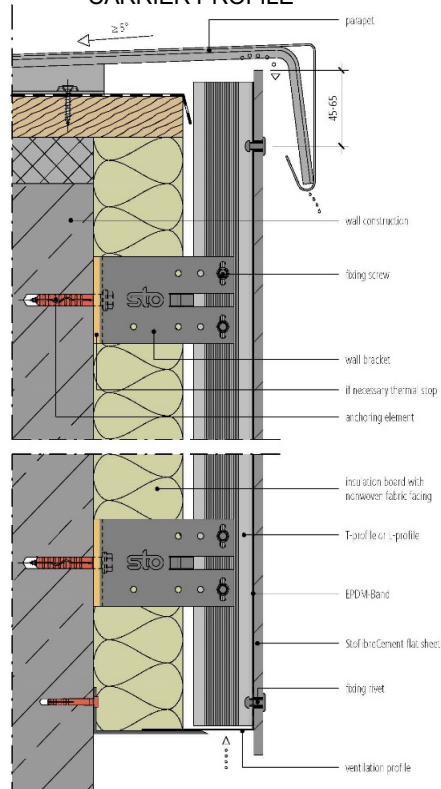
WALL BRACKET/TIMBER BATTENS
